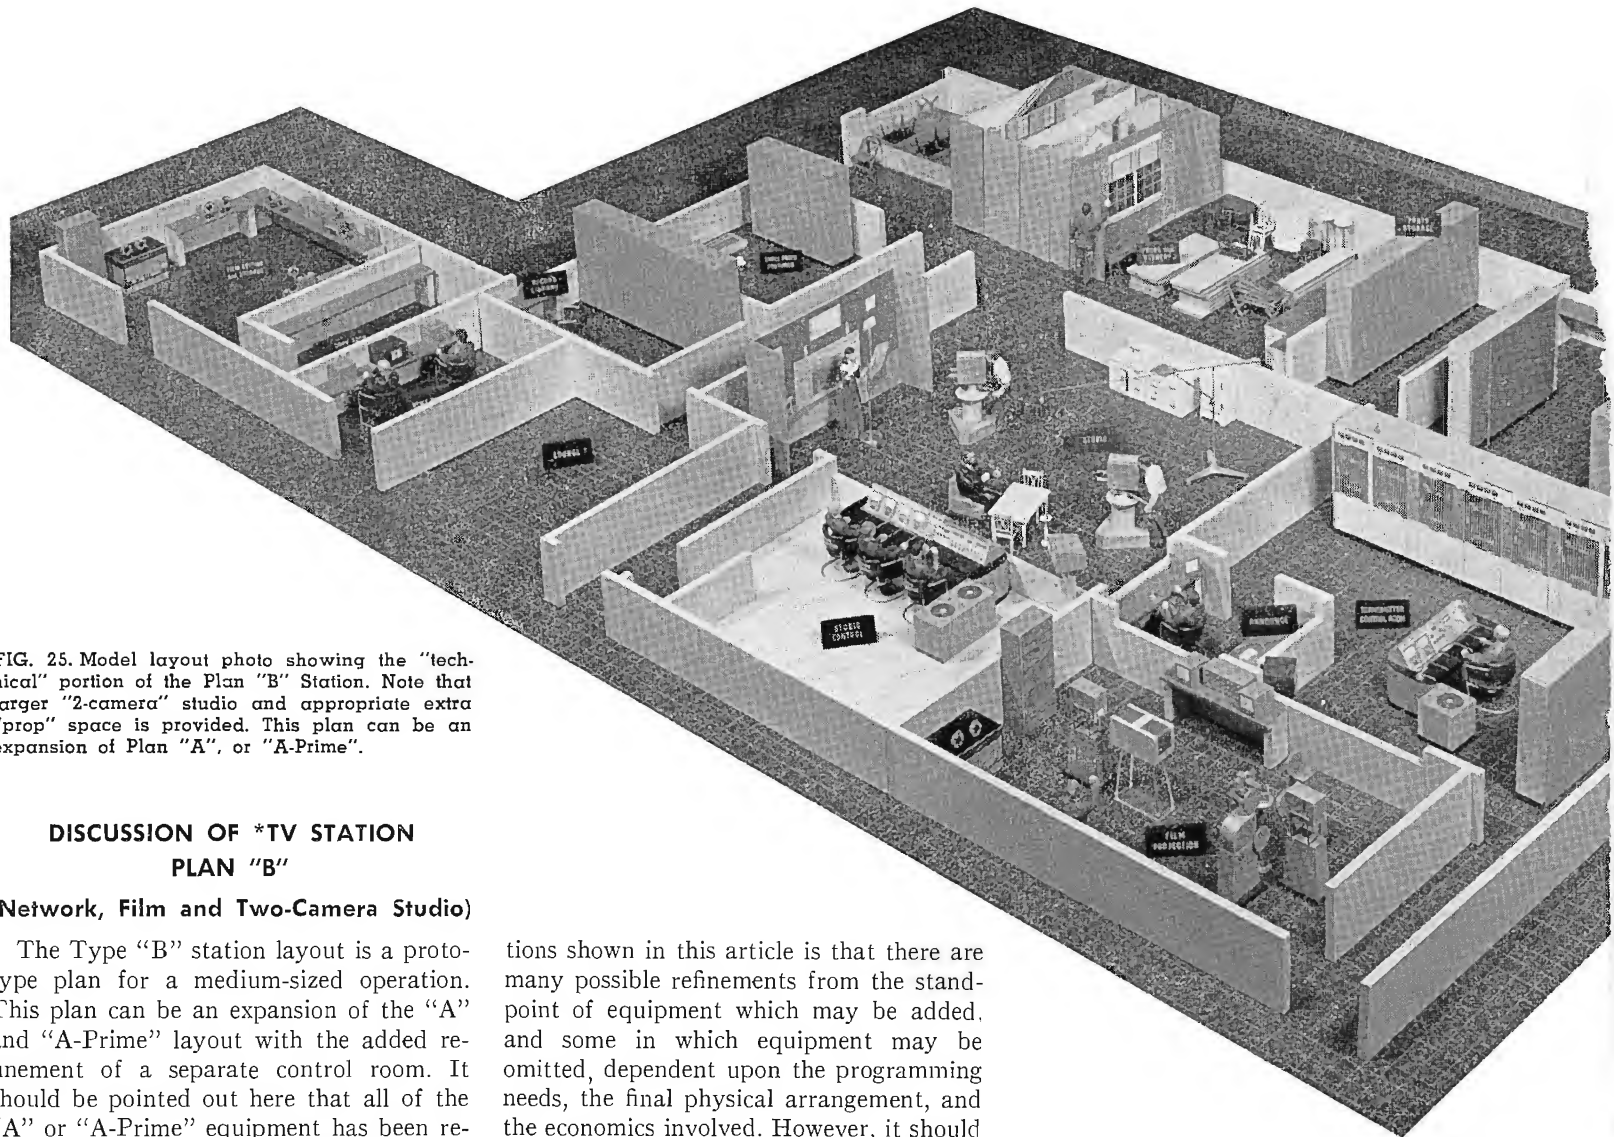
Model layout photo showing the "technical" portion of the Plan "B" Station. Note that larger "2-camera" studio and appropriate extra "prop" space is provided. This plan can be an expansion of Plan "A", or "A-Prime".
